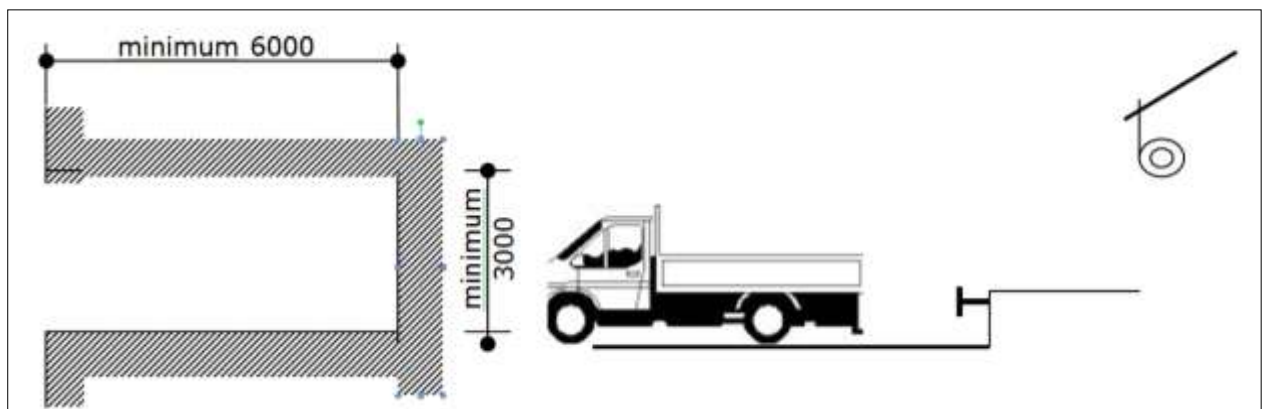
Service Areas – Loading and Unloading Dock Diagrammatic cross section and minimum dimensions
